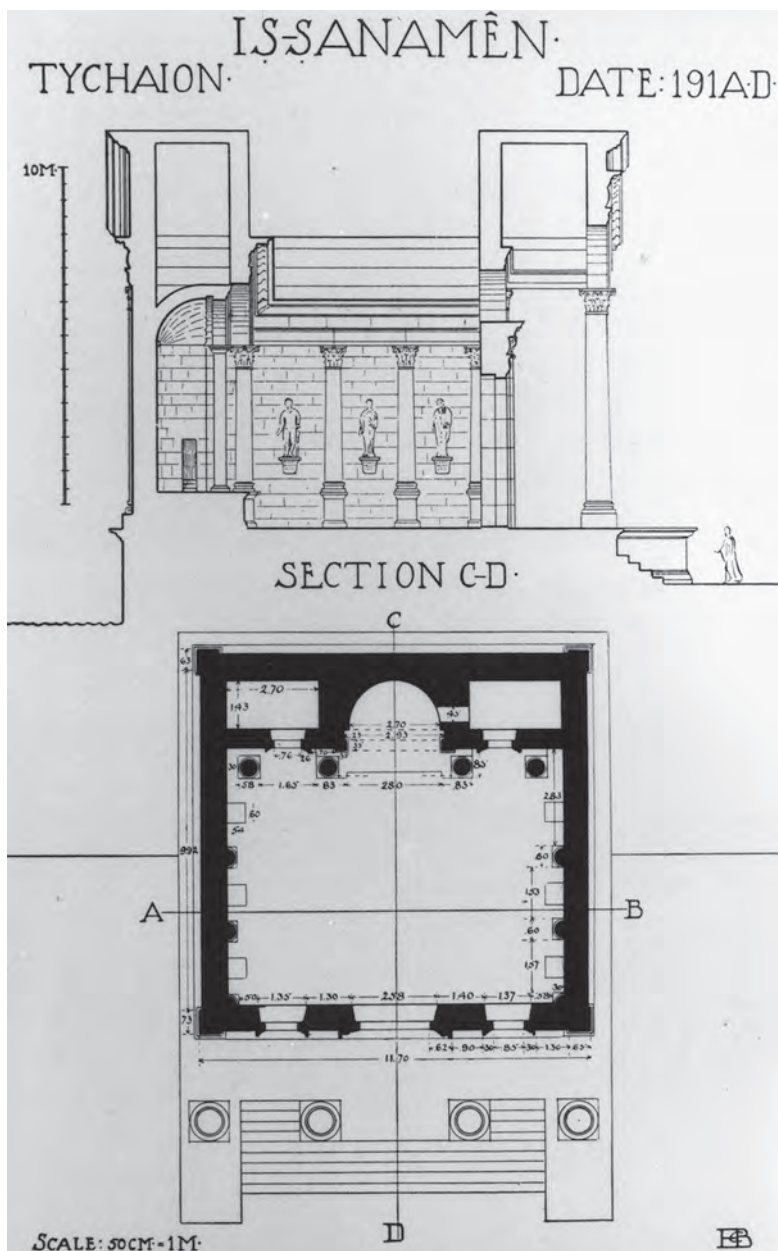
Plate XXI Is-Sanamem: temple of Tyche, plan and suggested reconstruction.
